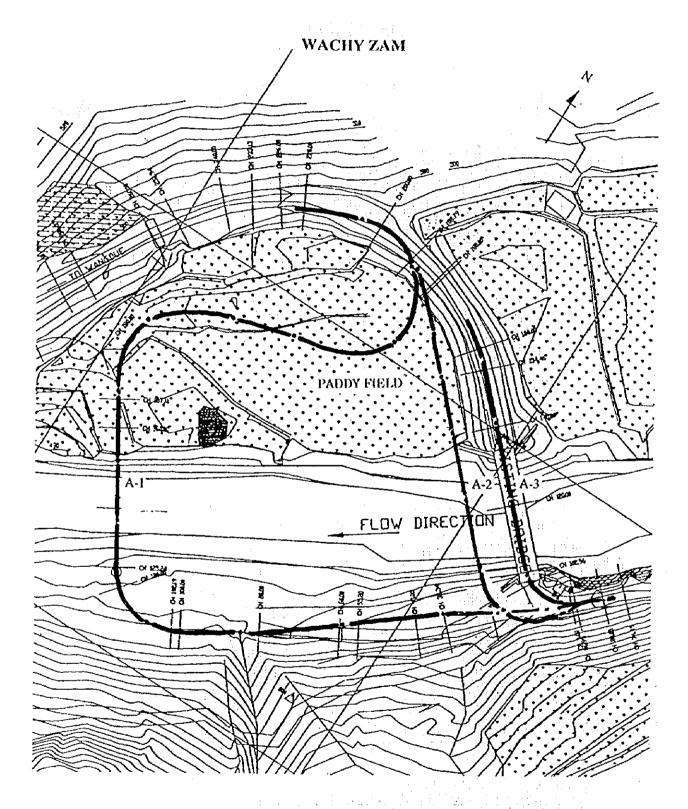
Plan of Alignment Alternatives for Bridge No. 4 Wachy Zam (Not to scale)
